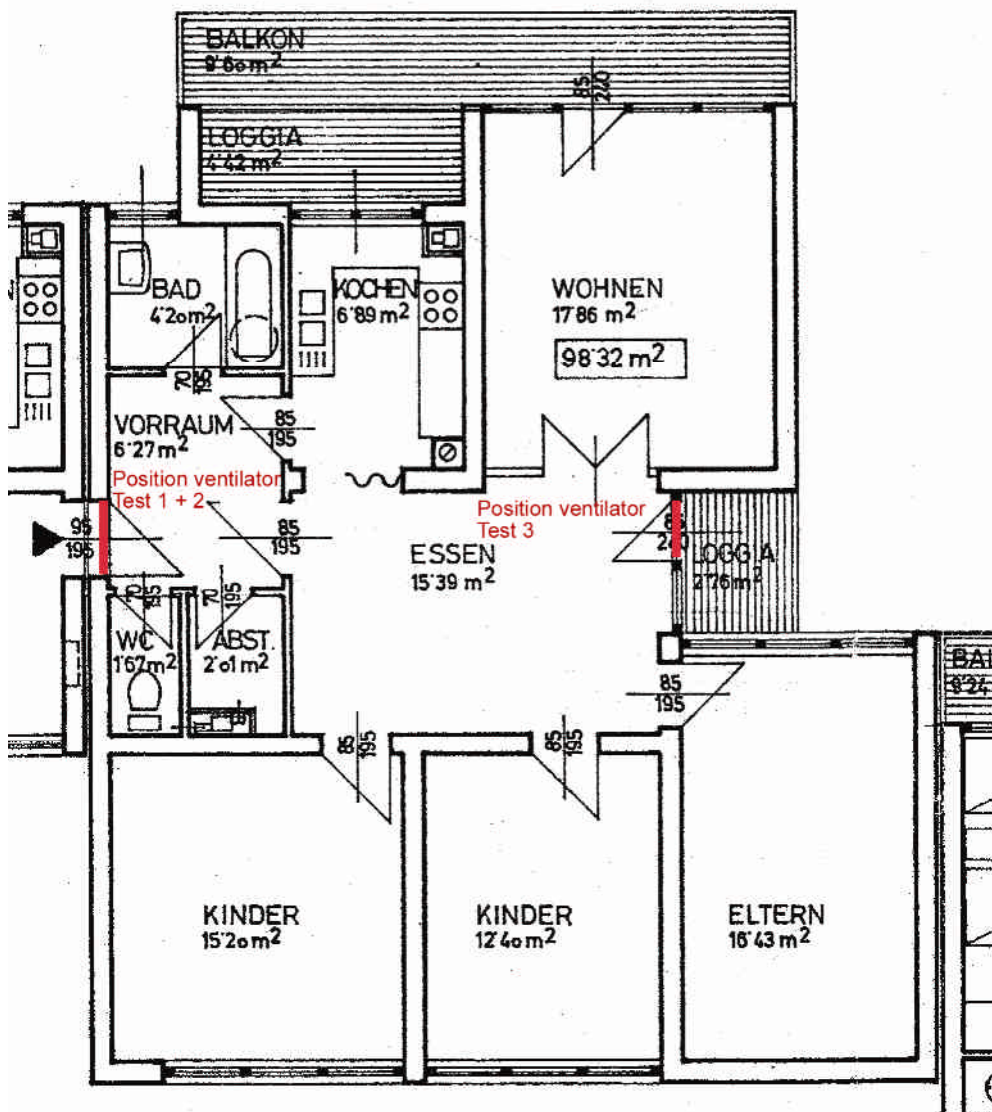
Schema of Blower Door testing in the Demohouse dwellings
